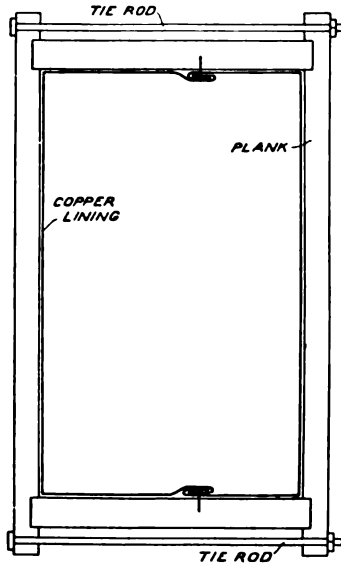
Plan of Storage Tank in Case Made of Planks Bolted Together.
